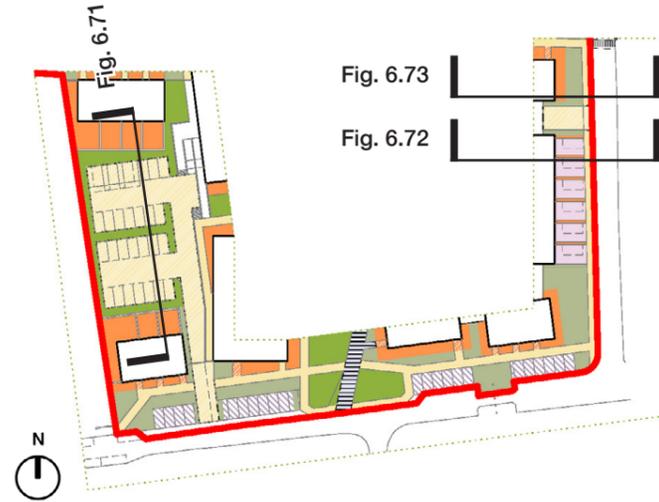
Coding plan - stitching around Bonner Hill - Plots F and J.
